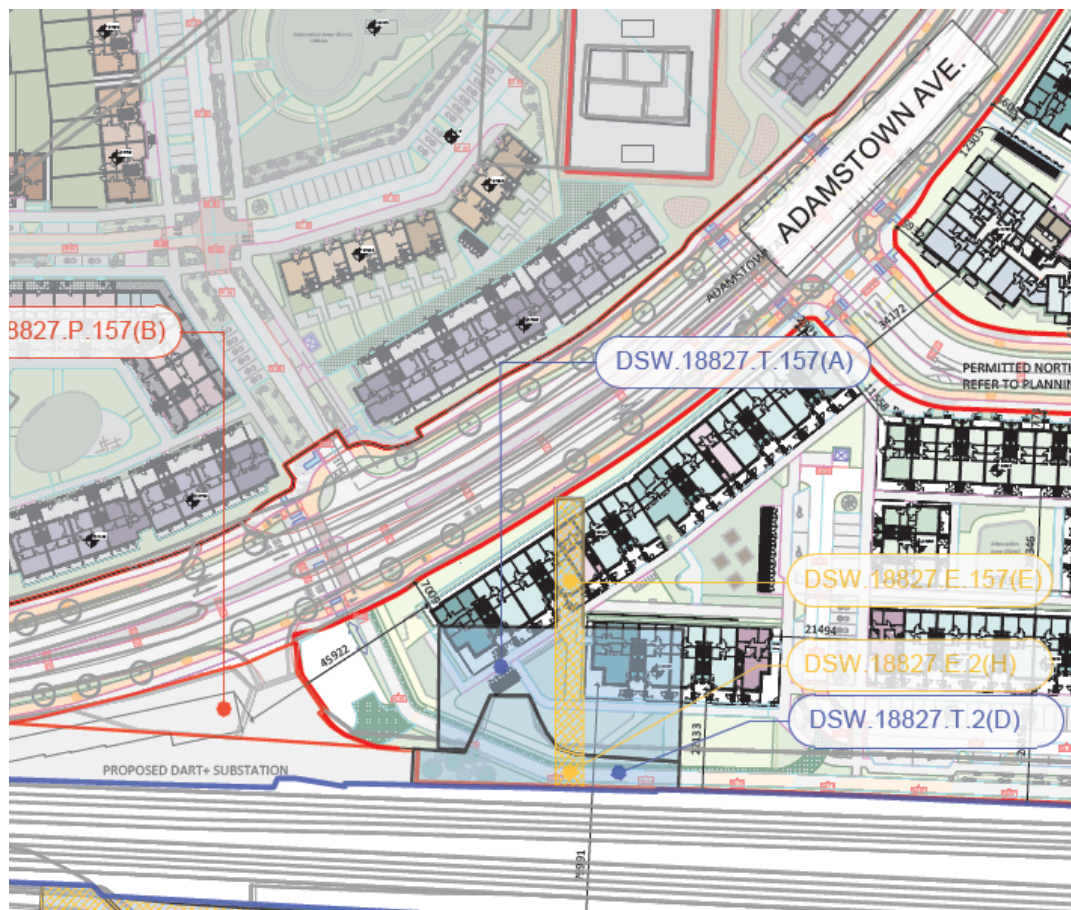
Overlay of Dart+ Property Plan on Site 3 Layout showing potential impact of Proposed Easement.
